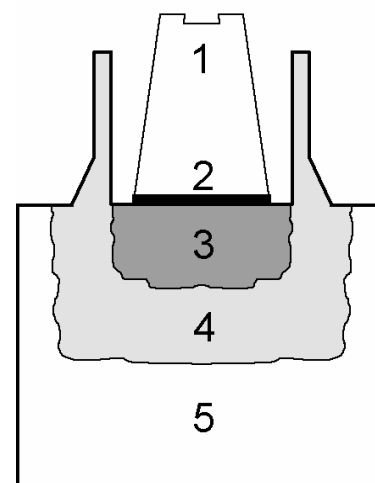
A Scheme of a Foundation Under a Hammer Reconstructed with SFRC (1- Anvil, 2- Shock Absorption Pad, 3- SFRC, 4- Ordinary Concrete, 5- Old Concrete Block) (Jamrozy 1983).
